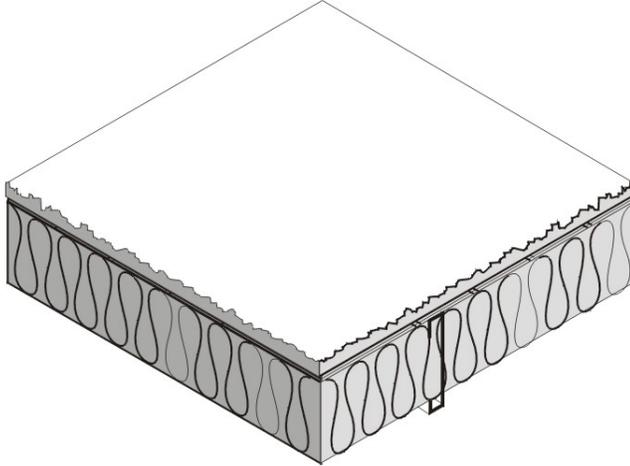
Metal Framed Floors with a Crawl Space
